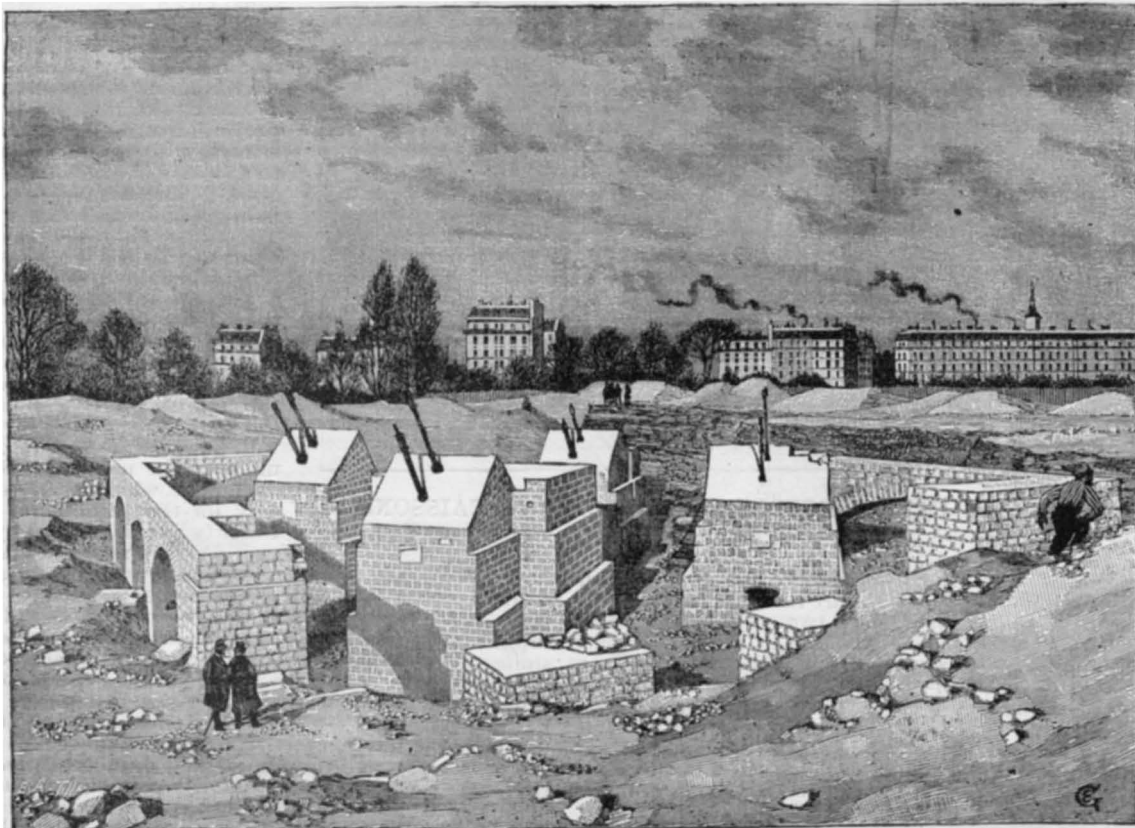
MASONRY FOUNDATION FOR ONE OF THE COLUMNS OF THE EIFFEL TOWER.
